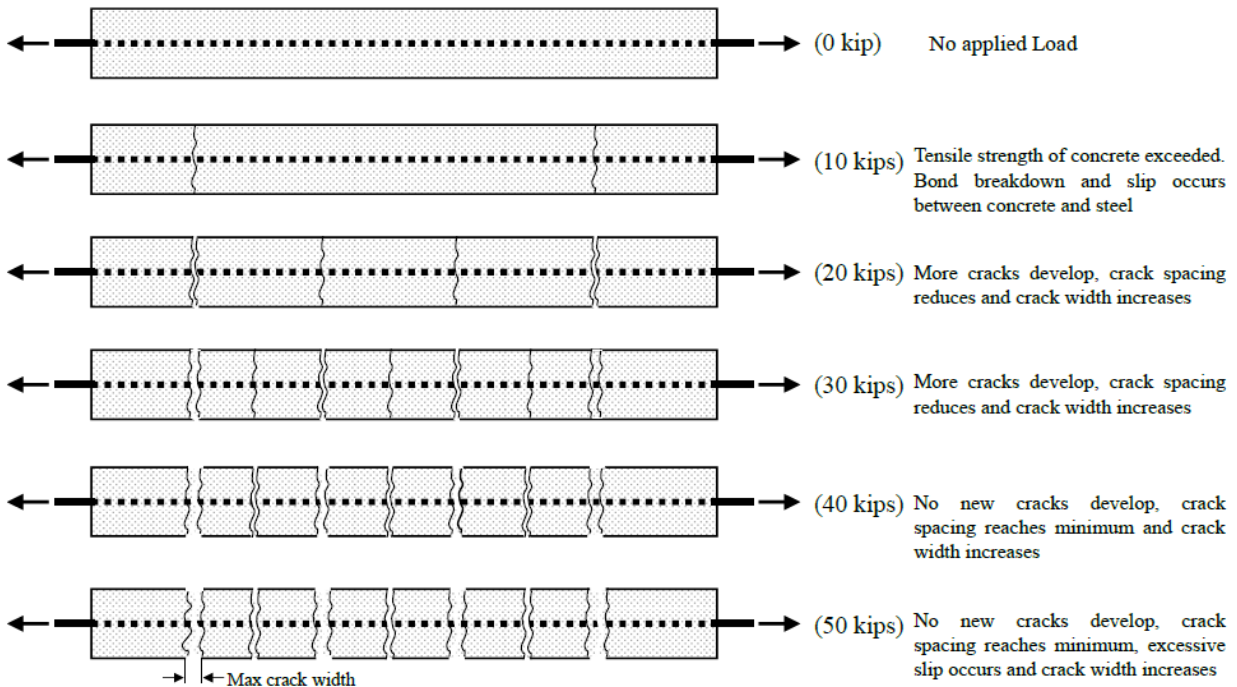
Typical Cracking Mechanism in Direct Tension Test Specimens (Source: Baah and Patnaik, et, al. 2015)
